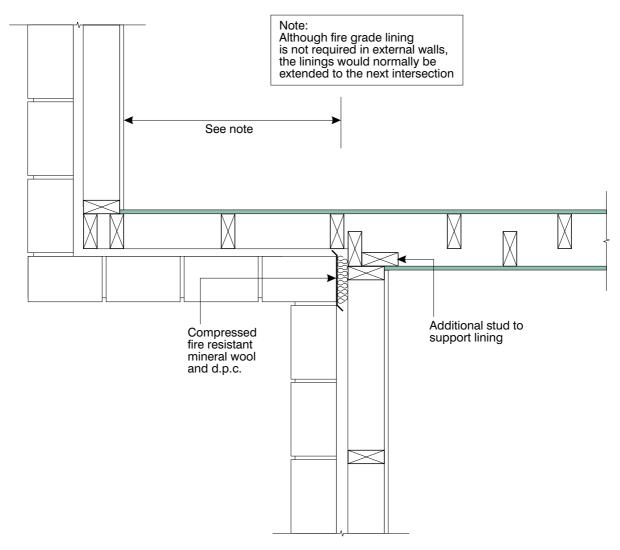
INTERSECTION WITH NON-ALIGNED EXTERNAL WALLS
